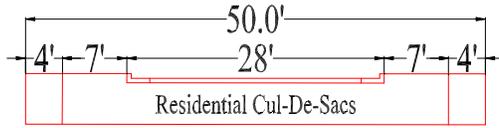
TYPICAL STREET CROSS-SECTIONS
